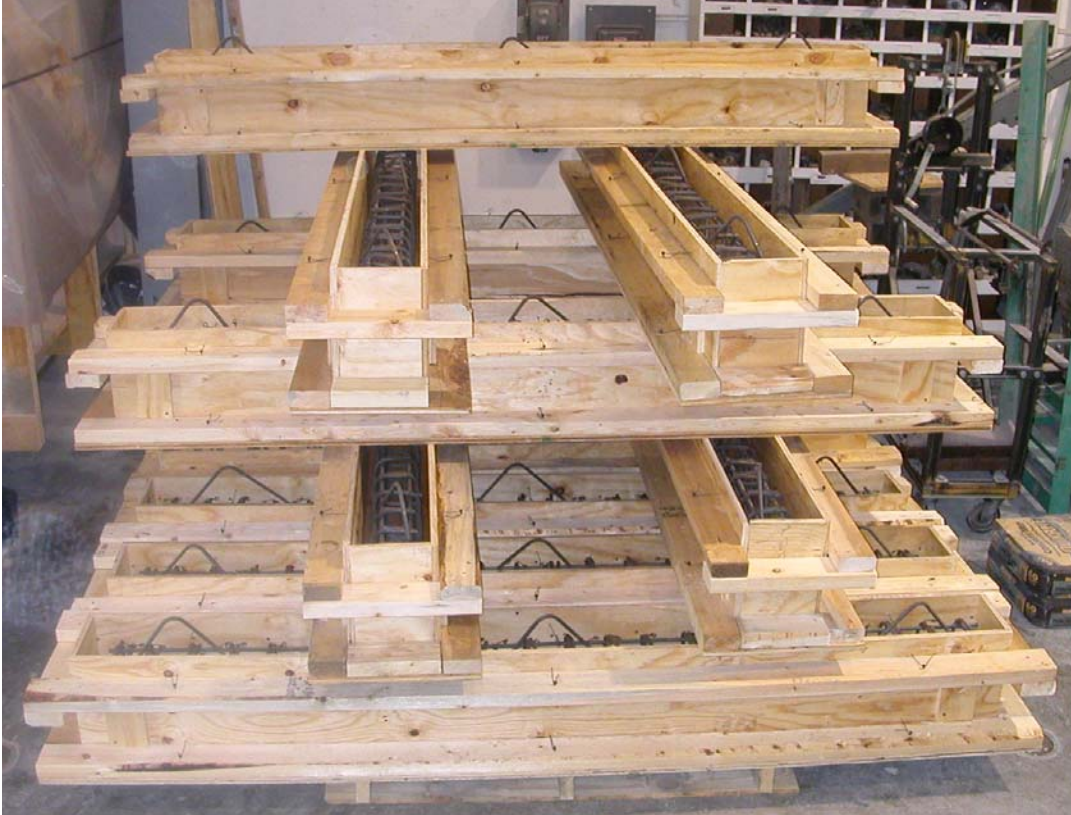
Storage of forms with reinforcement cages mounted inside.
